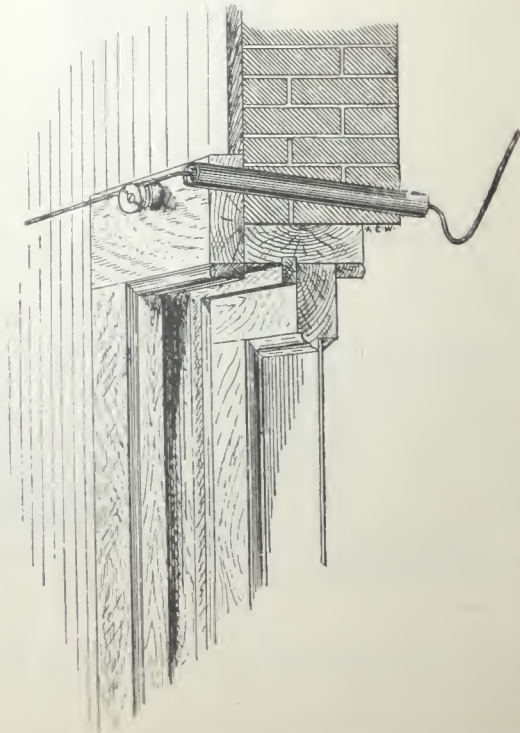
Illustrates the use of conduit in carrying wires into a building from a pole outside.
